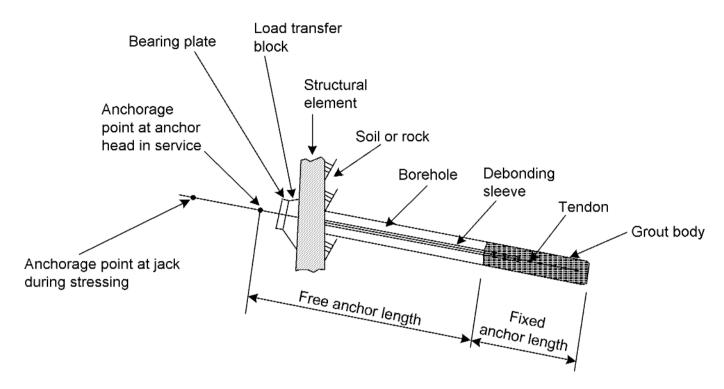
Sketch of a typical ground anchorage, (from BS EN 1537, 2000)
